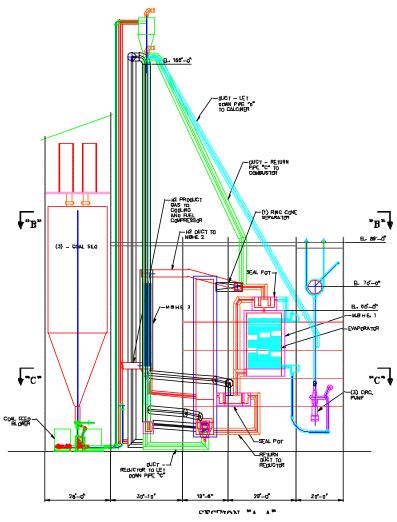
3: Case-13 Gasifier Island General Arrangement Drawing – Side Elevation
